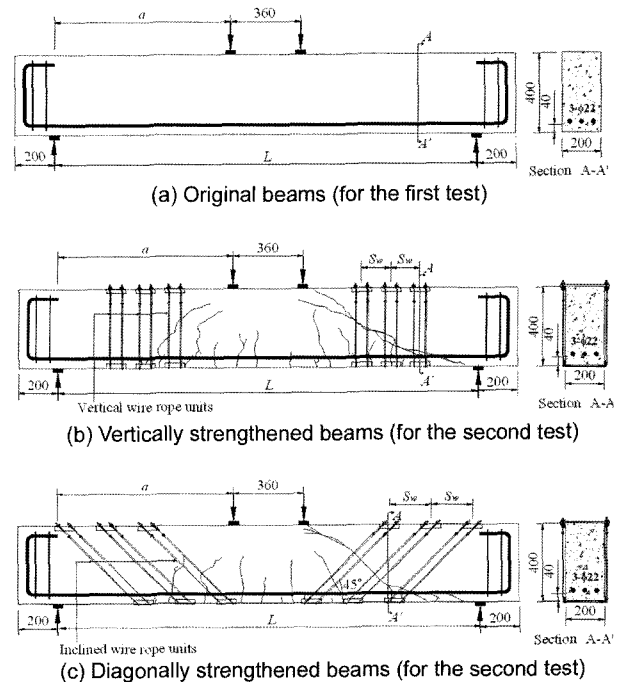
Beam tested details and arrangement of wire rope units (unit: mm)
